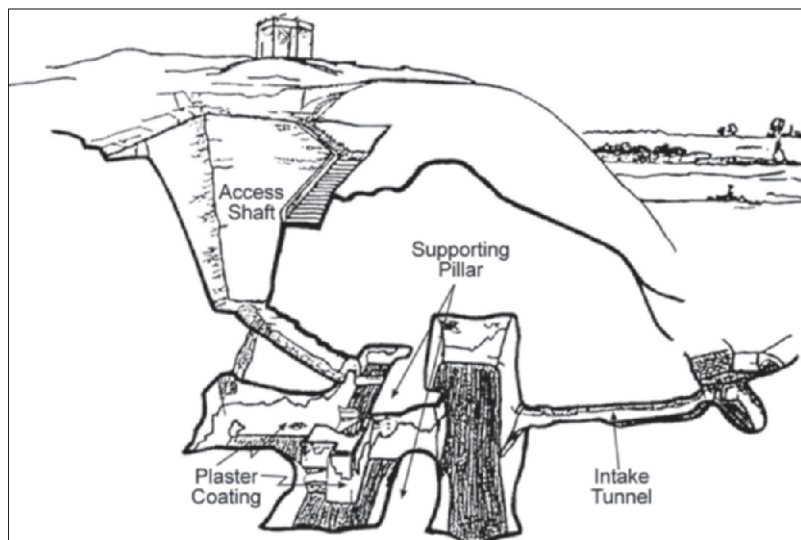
Artist conception of underground water reservoir in Tel Beer Sheva.
